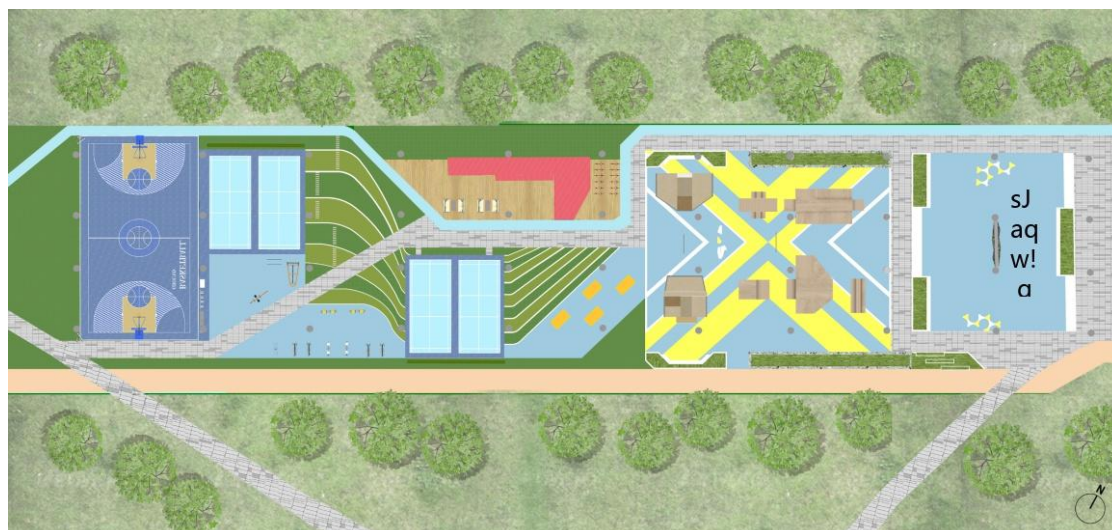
Plan of Sports Park Section (Drawn by the author)
